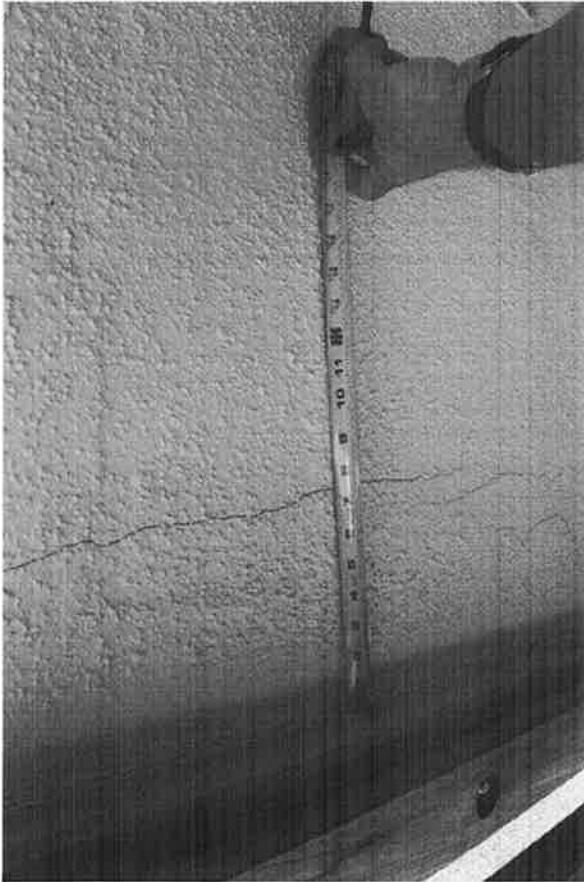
Hairline crack in area of previously repaired CMU wall at unit 201 (typical)
